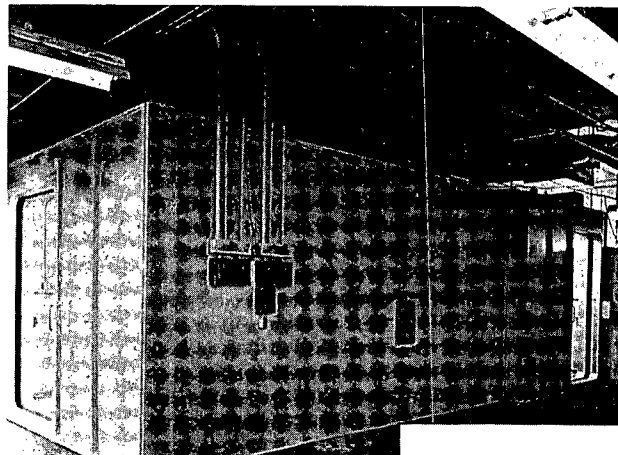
FIG. D: ALL-WELDED DUAL SHIELDED ROOM, 3/16" THICK STEEL; RED/BLACK ISOLATION BETWEEN ROOMS, COURTESY LECTROMAGNETICS, INC.
